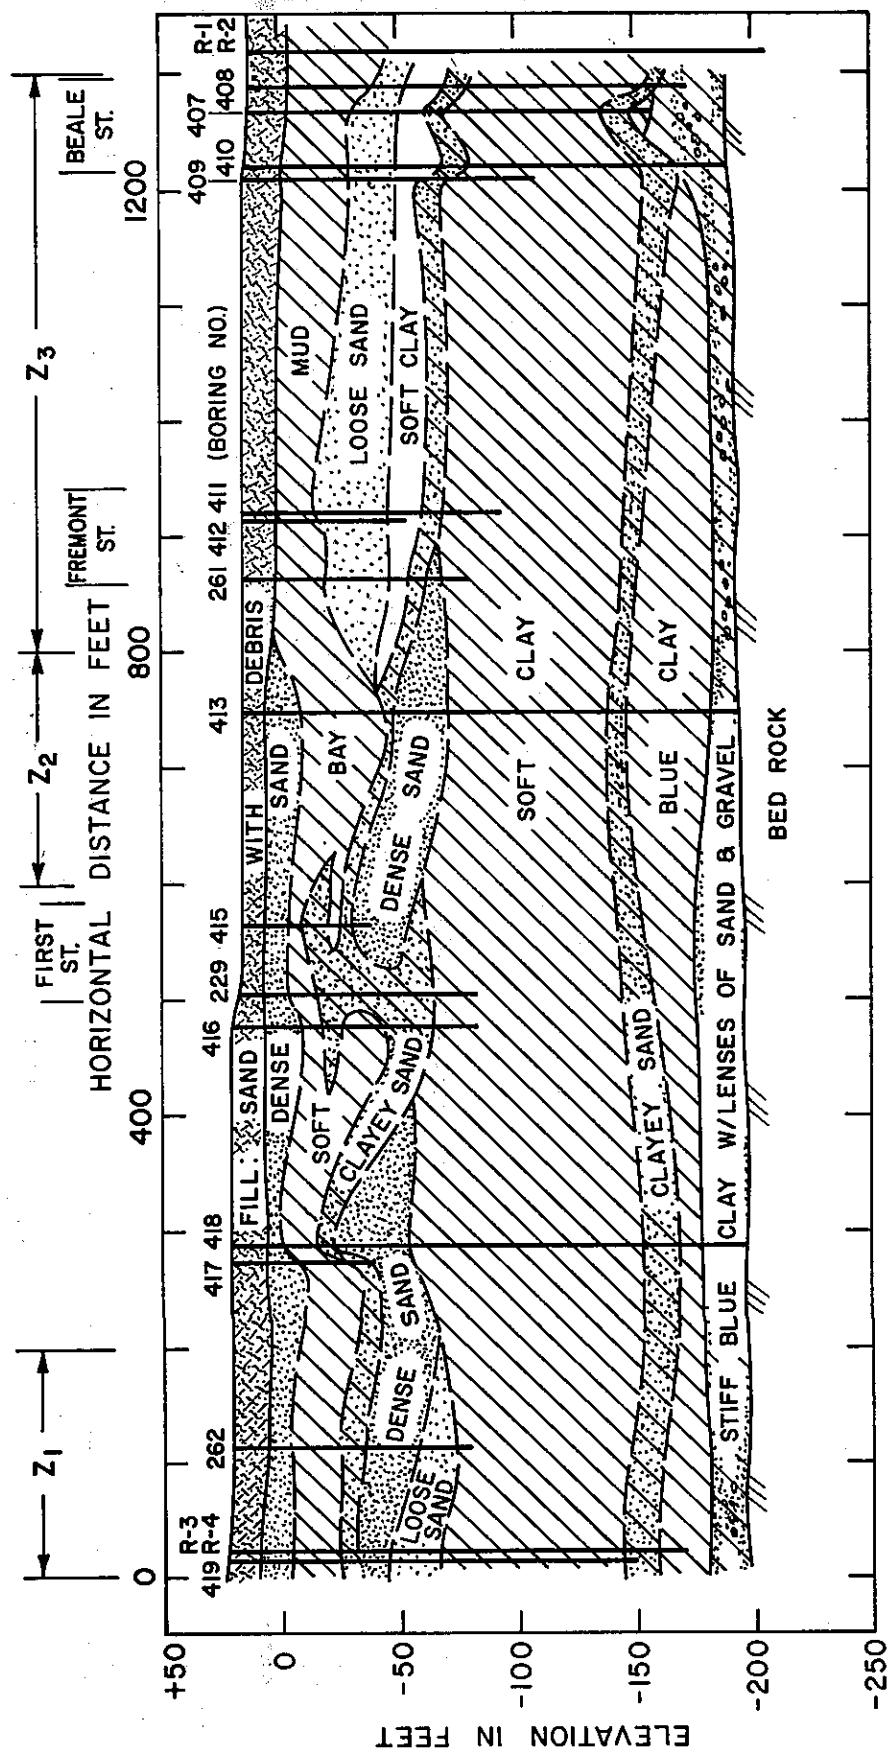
Z SOIL SECTION PROFILE "Z-Z"
